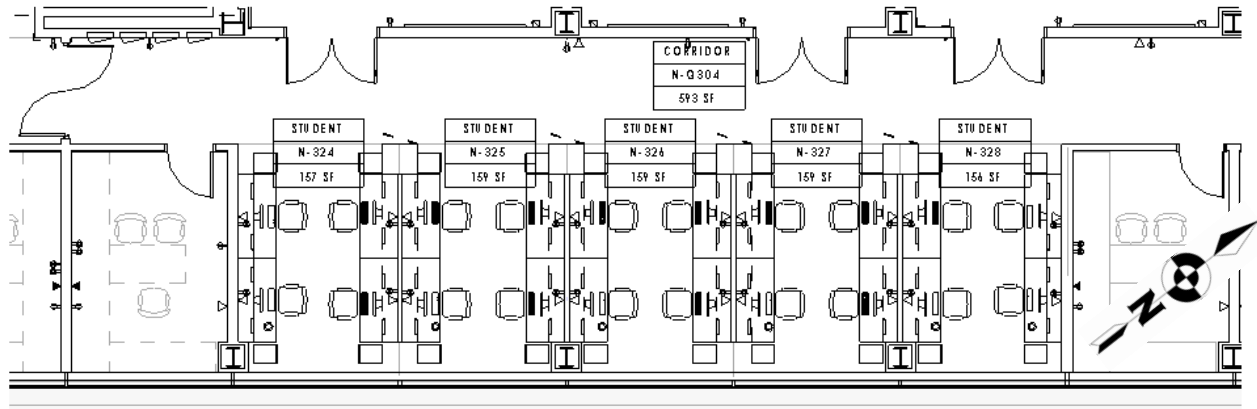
Student Study Area Floor Plan, NTS, from KGB Maser Central Revit model
